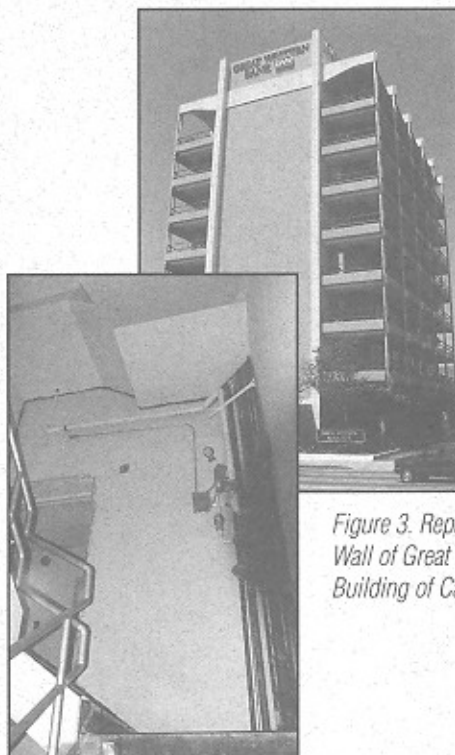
Repair of Concrete Wall of Great Western Bank of Building of California
